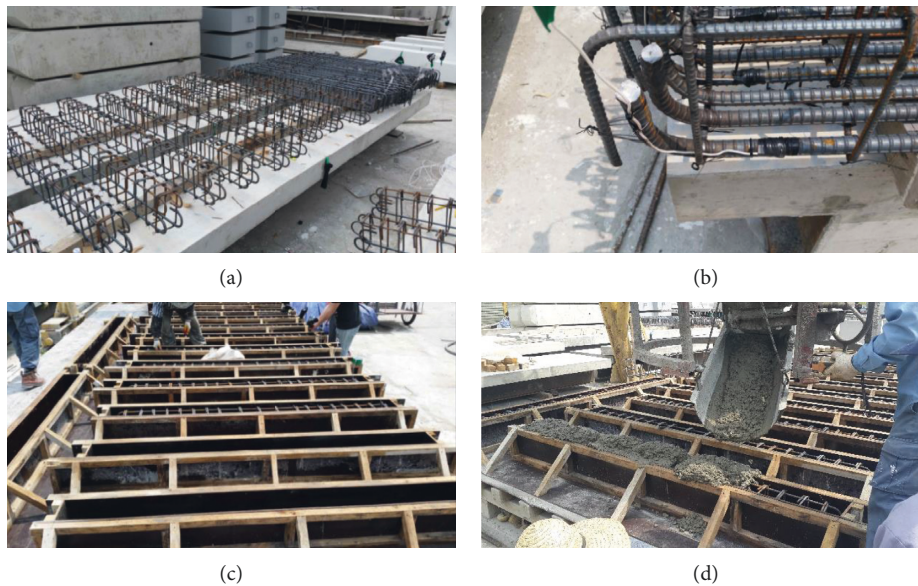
Beam manufacturing process: (a) assembly of reinforcing bar cage, (b) wire for corrosion of reinforcing bar, (c) installation of reinforcing bar cage, and (d) placement of concrete.
